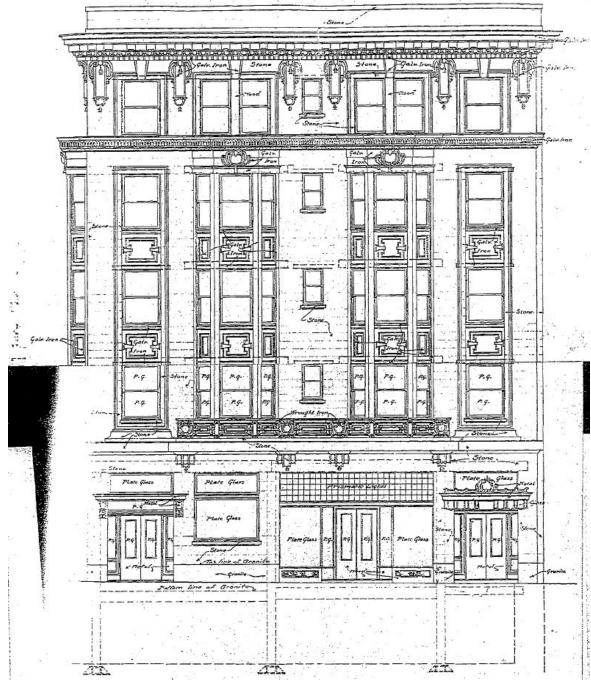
Original elevation drawing of Clay Street (southeast) façade
